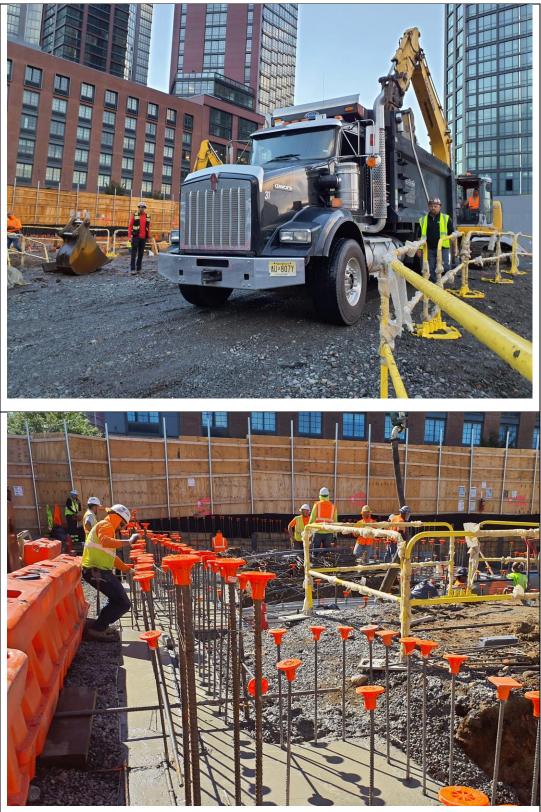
View of STNY pouring concrete for grade beams in waste characterization grid COMP H (facing west).
